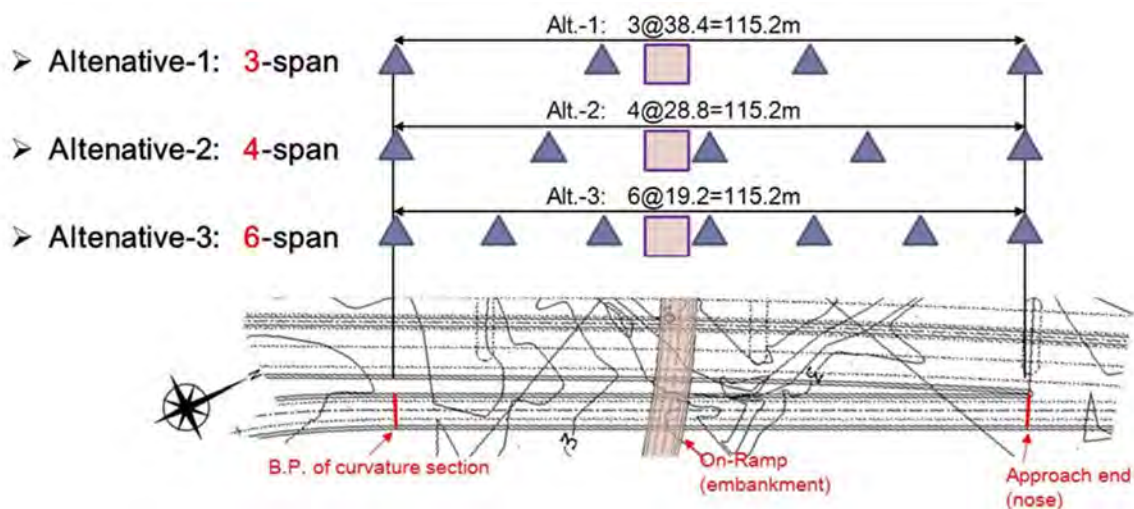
Control Points for Bridge Length and Span Arrangement
